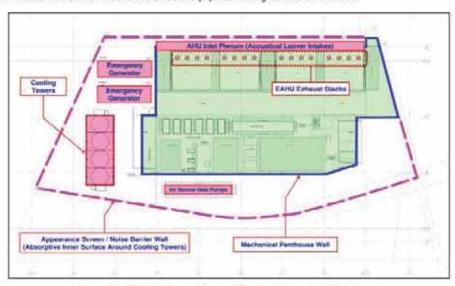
80 First Street: Outdoor Rooftop Mechanical Equipment
